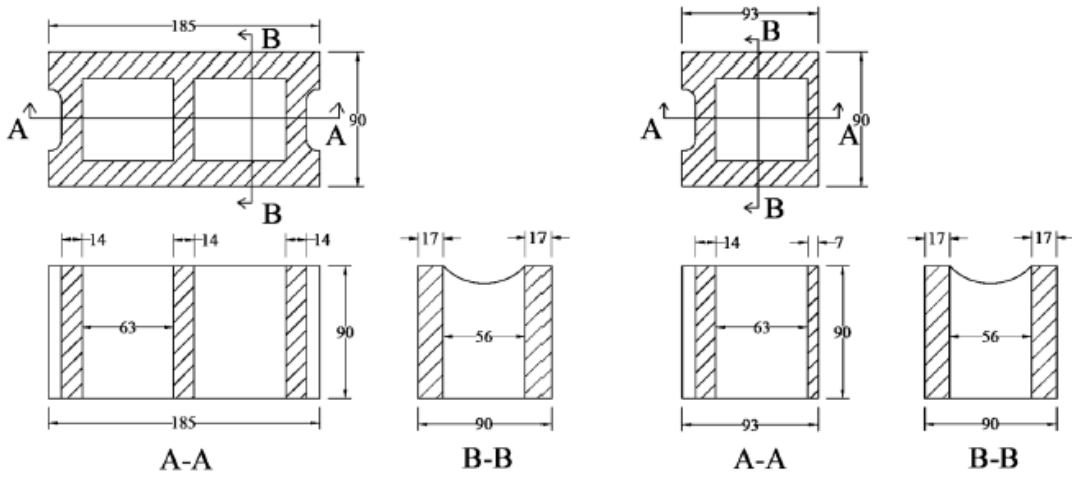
Dimensions of Half Scale Concrete Masonry Units (unit: mm)
